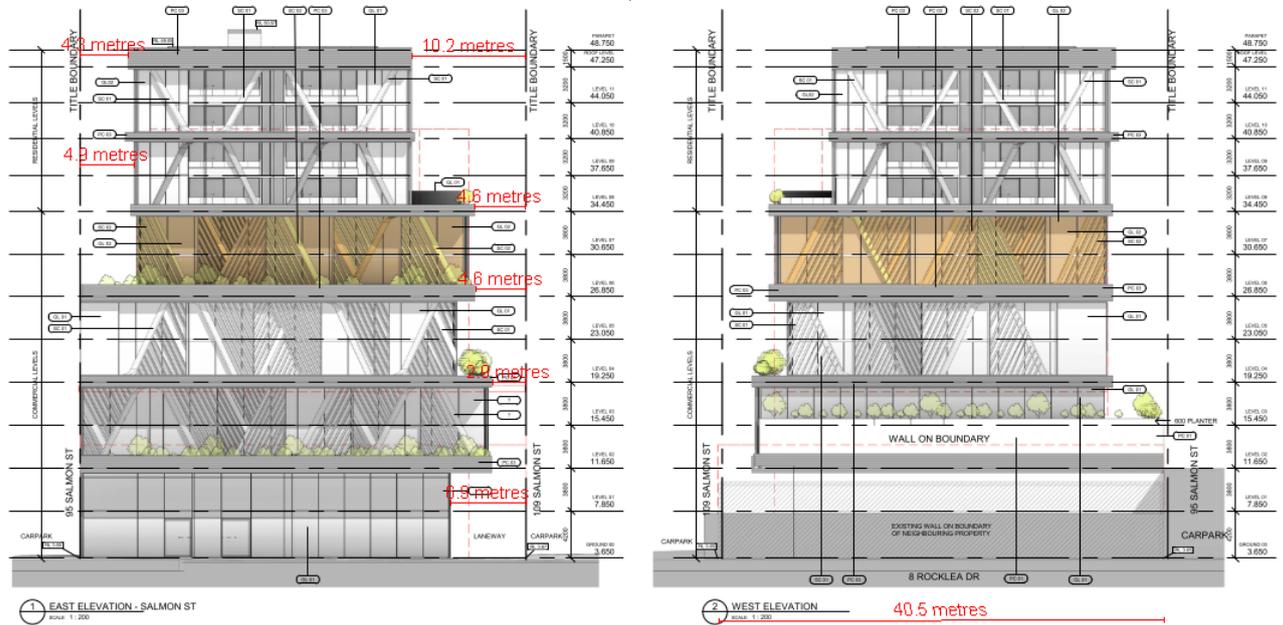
Front and rear elevation of proposed amendment plans, previous built form shown in via red outline.
